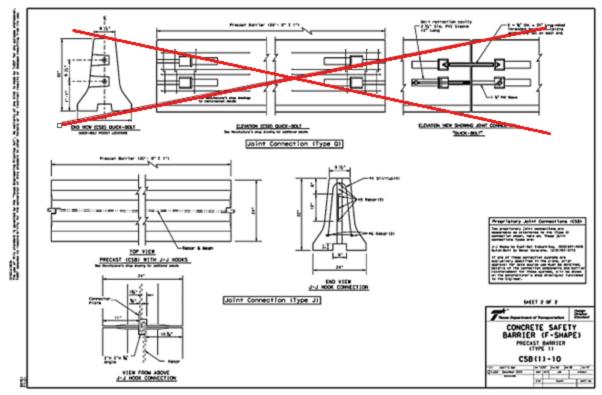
Connection Details for PCB Segments Used in Test Nos. 440592-1 and -2.
